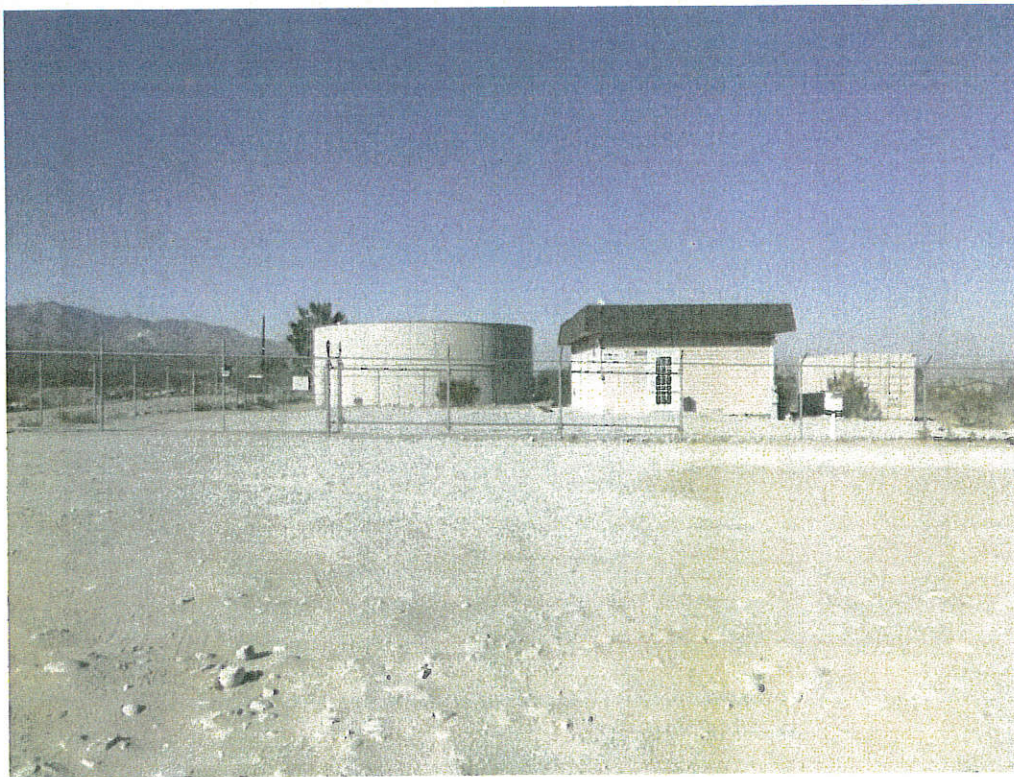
Jubilee Mutual Water Co. headquarters, modular building and water tanks viewed from Joshua Avenue looking west.
